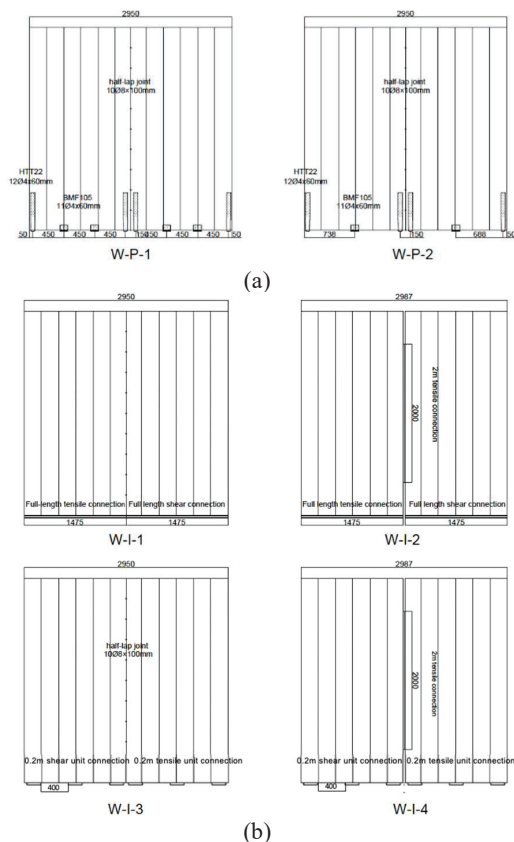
Geometries and connection arrangements of the investigated walls: (a) walls with conventional plate connectors, (b) walls with the MOD-IT connectors
